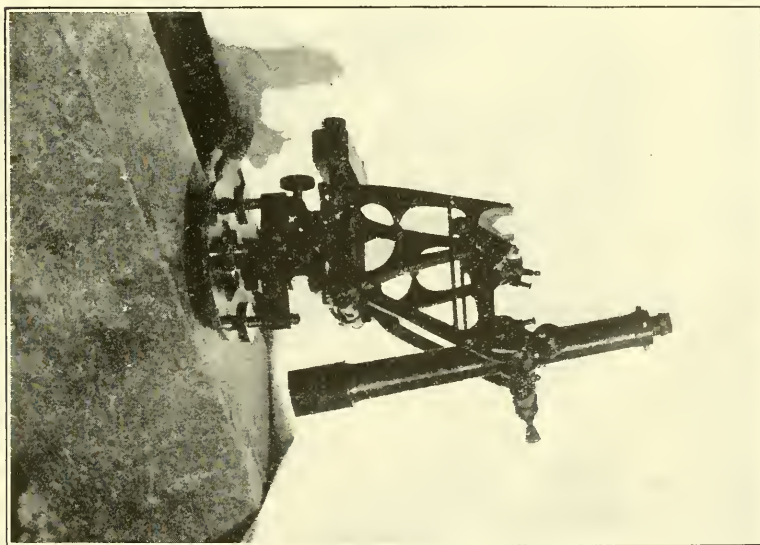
VERTICAL SIGHTING TRANSIT USED FOR LINE DROPPING, KONDOU PRESSURE TUNNEL.
